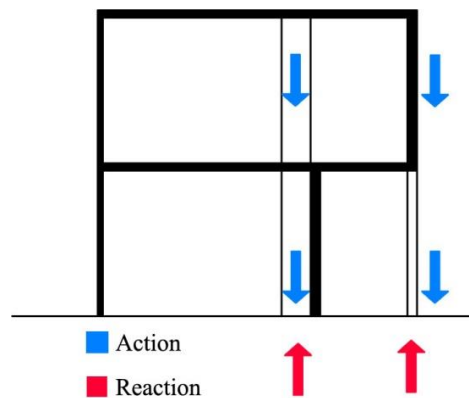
Forces diagram in a building façade and a multi-angled façade unit connected to it according to scenario 1
